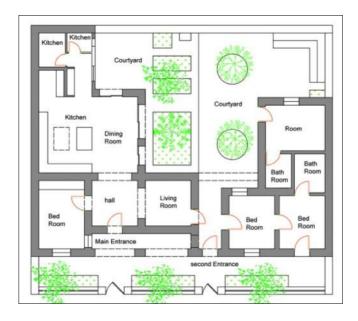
The original and adapted plan of the house (Author, 2012)
